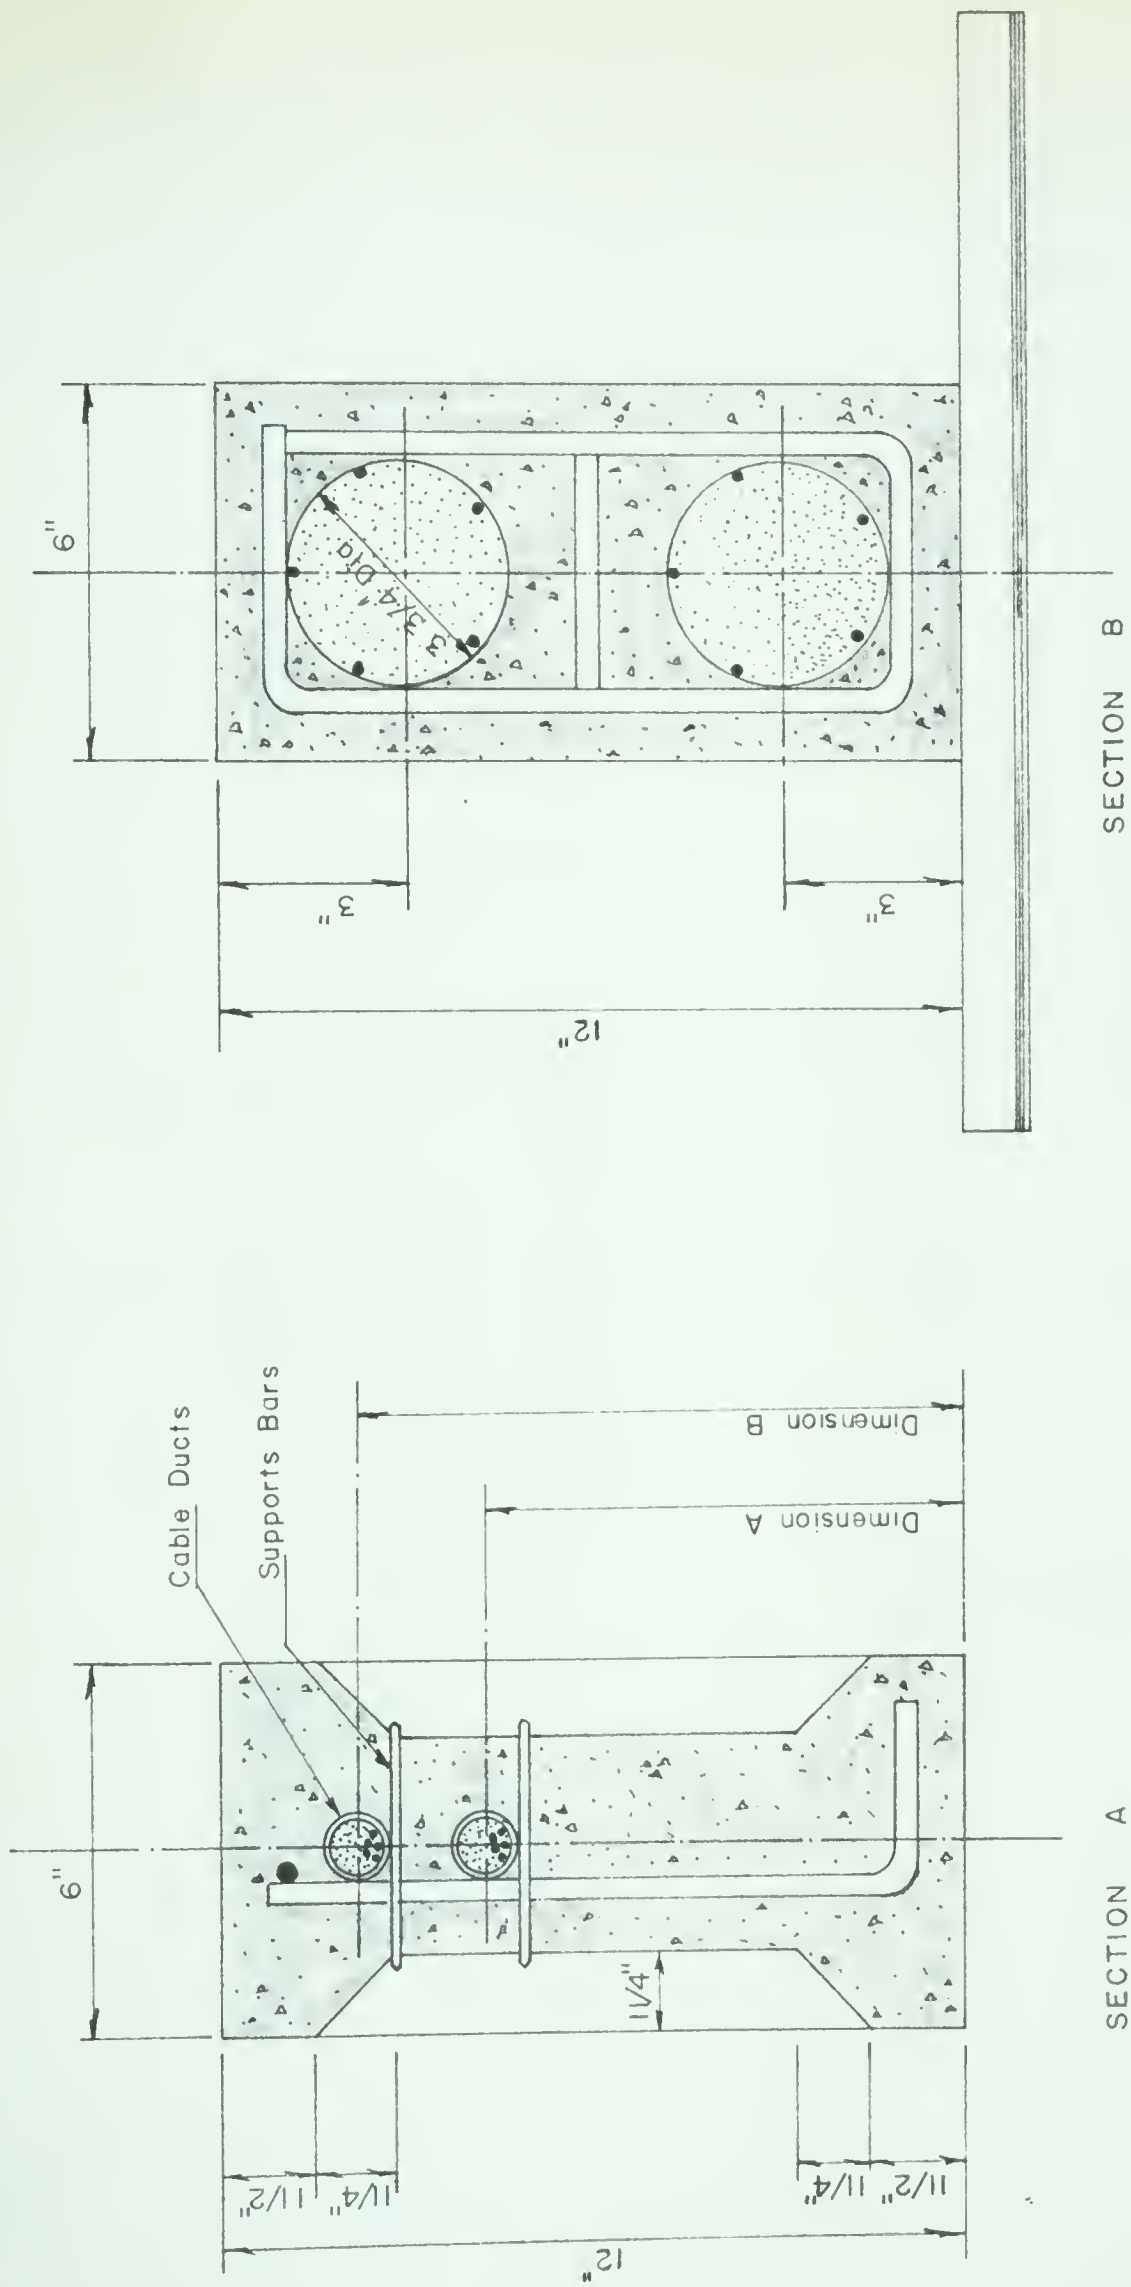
(b) DETAILS OF POST-TENSIONED BEAMS
